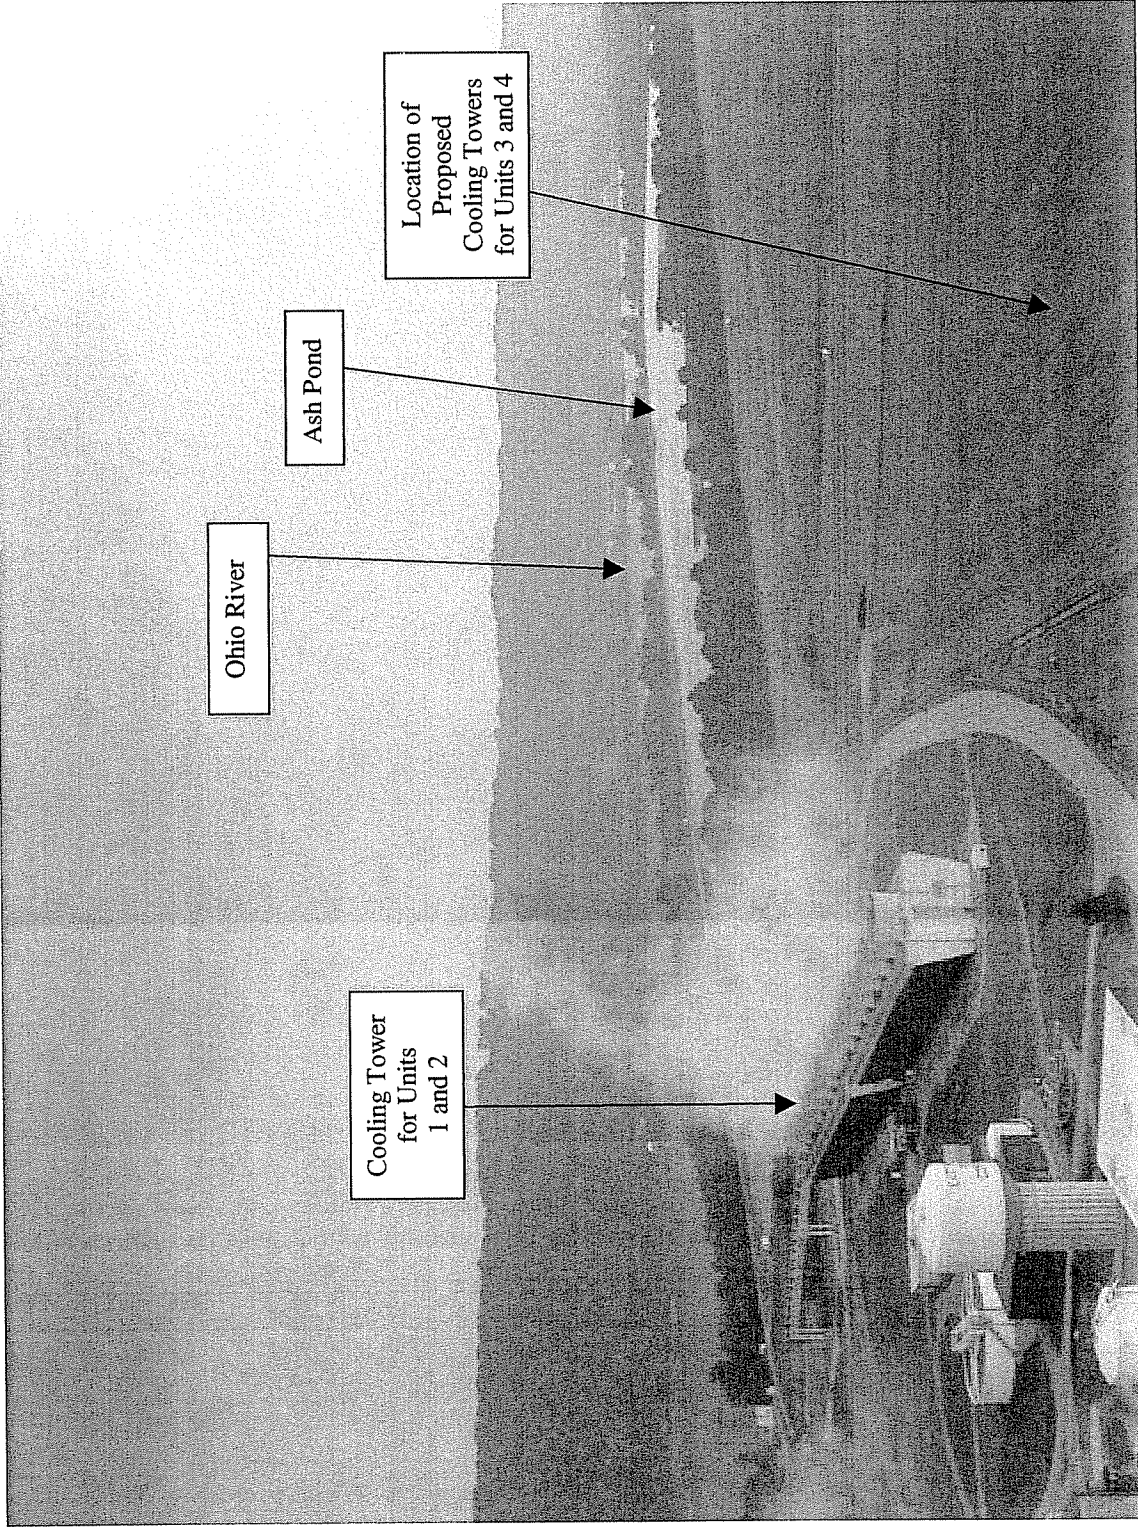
Facing Northeast. From Top of Building Units 1 and 2 on Left; Cooling Towers for Units 1 and 2 on Left; Proposed Site for Cooling Towers for Units 3 and 4 on Right.
